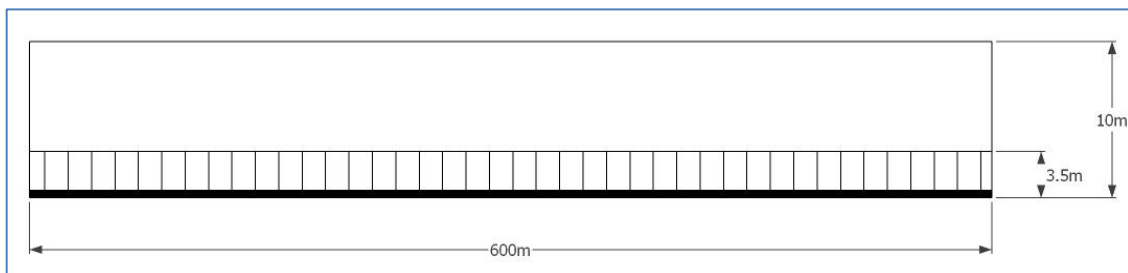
4 Horizontal alignment of reinforcements for MSE Wall 15 (not in scale)
